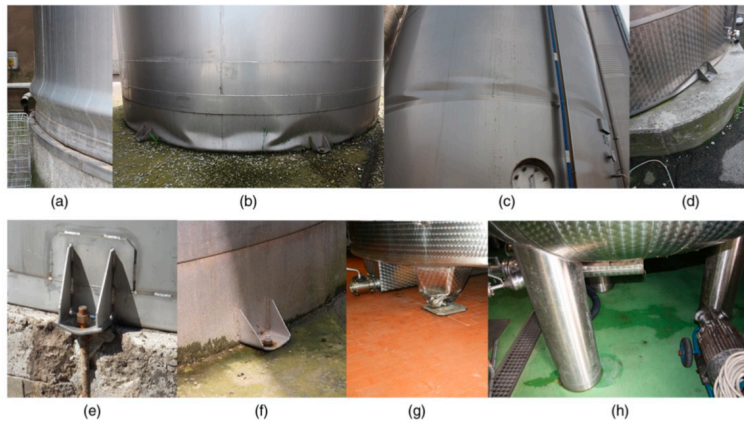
Observed failure mechanisms: (a) elephant's foot buckling; (b) diamond-shaped buckling; (c) secondary diamond-shaped buckling; (d) combined diamond buckling and failure of anchors; (e) concrete spalling at the anchorage; (f) bending of anchor plates; (g) shear-buckling of a leg; (h) sliding of an unanchored system
